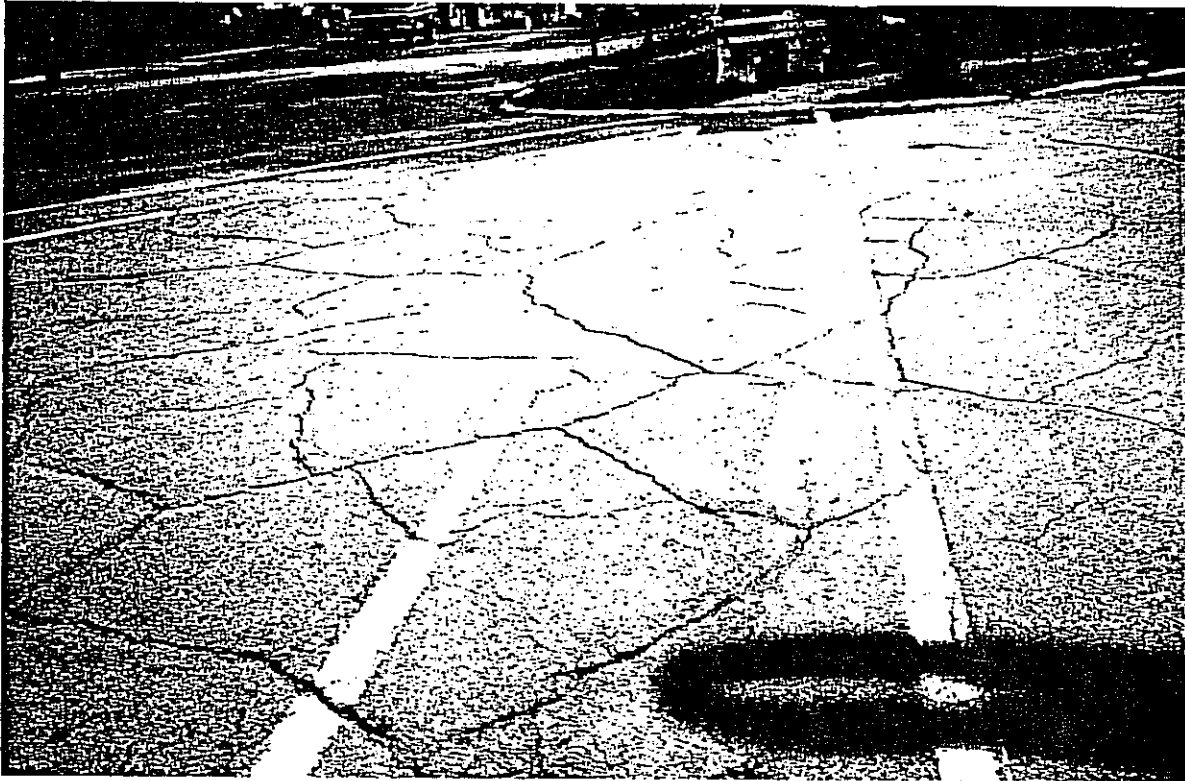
Photo G: Looking eastward along South Mill Street from intersection of South Mill Street and Arlington Avenue.
